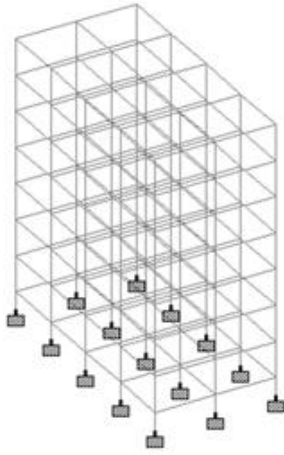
3d rendered view of rectangular shaped building (Model 1)
